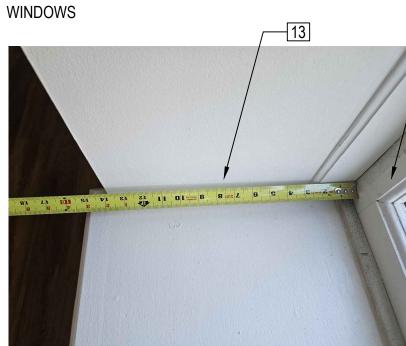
VIEW OF EXISTING TRIM, STOOL, AND WINDOW
